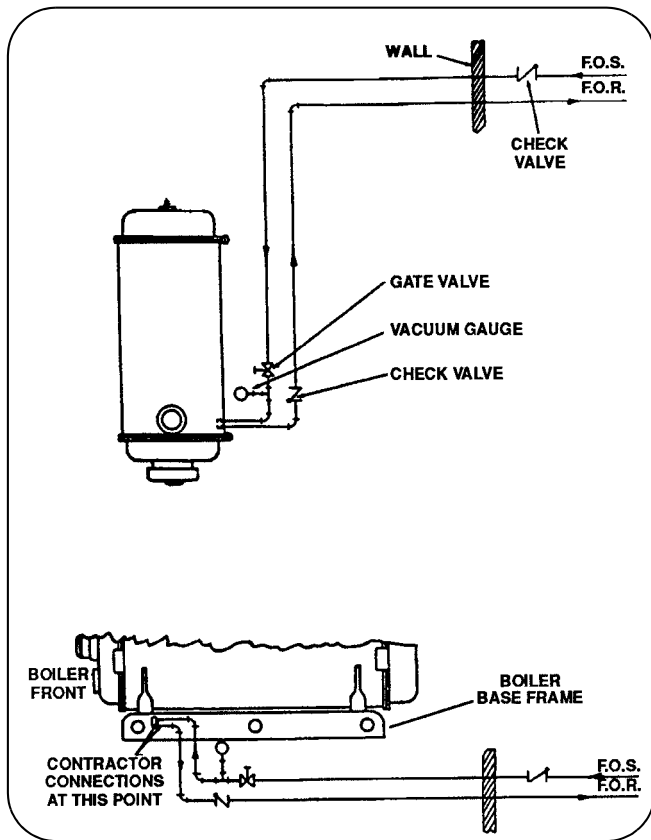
No. 2 Oil Piping, Single Boiler Installation, Oil Pump Integral With Boiler
